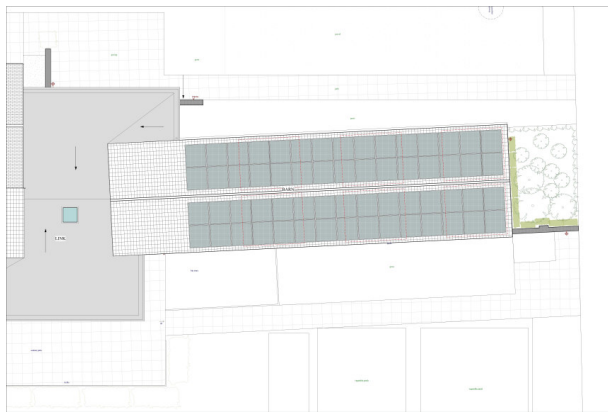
Plan showing the requested amendment to the PV panels for the barn roof.
